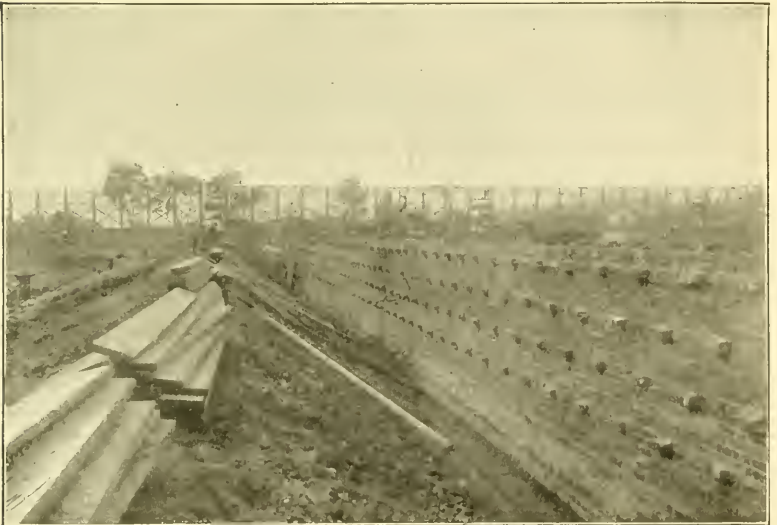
OUTSIDE WALL, READY FOR CONCRETE BACKING.
